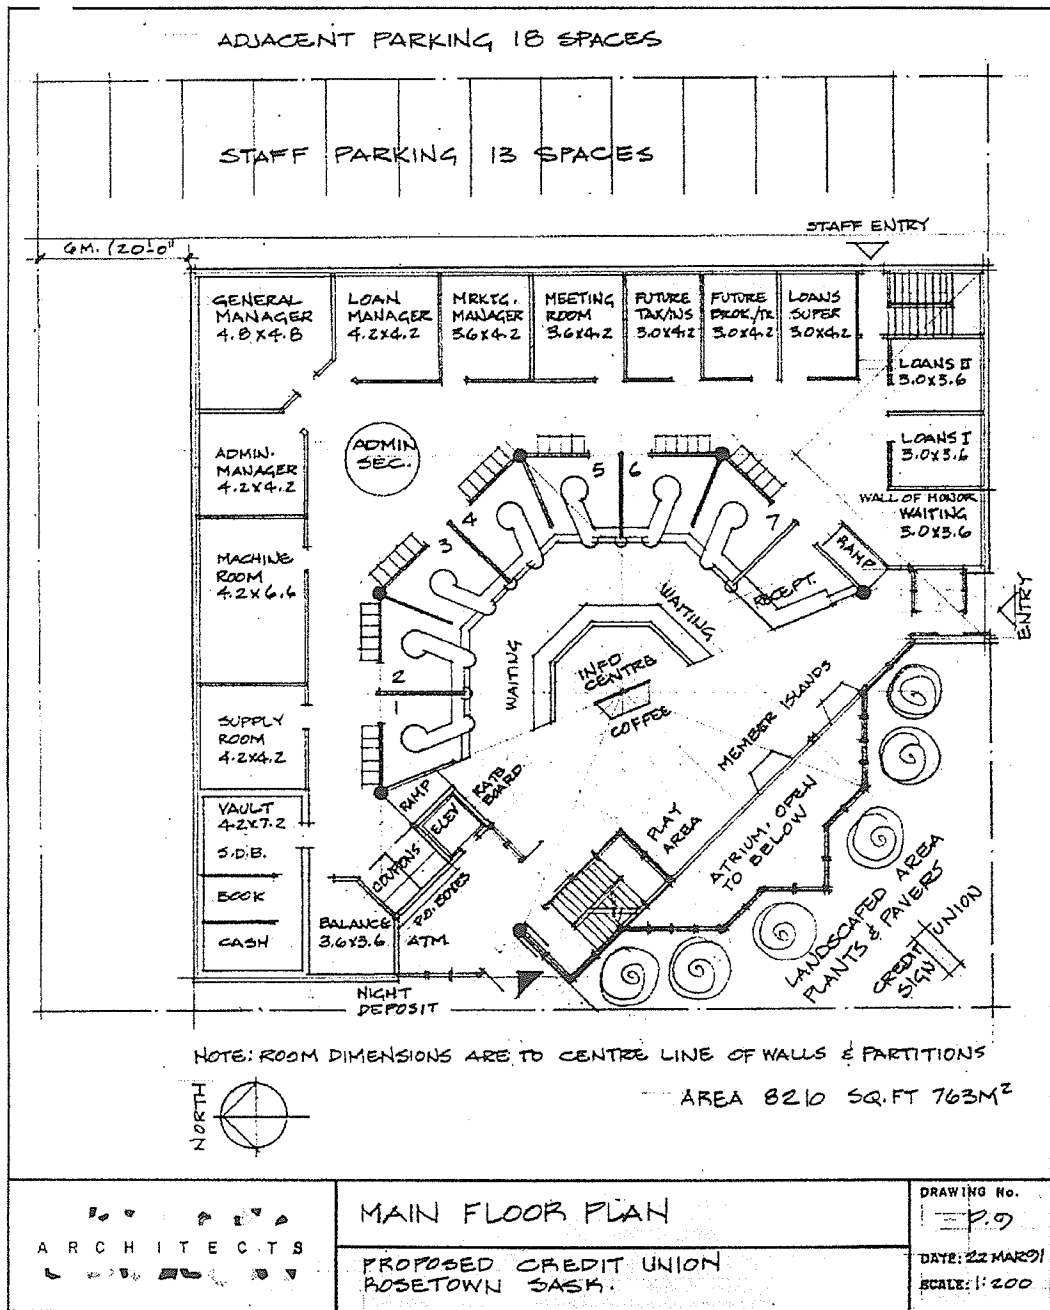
Architect design sketch 9, Main Floor Plan. Courtesy of the architect.
